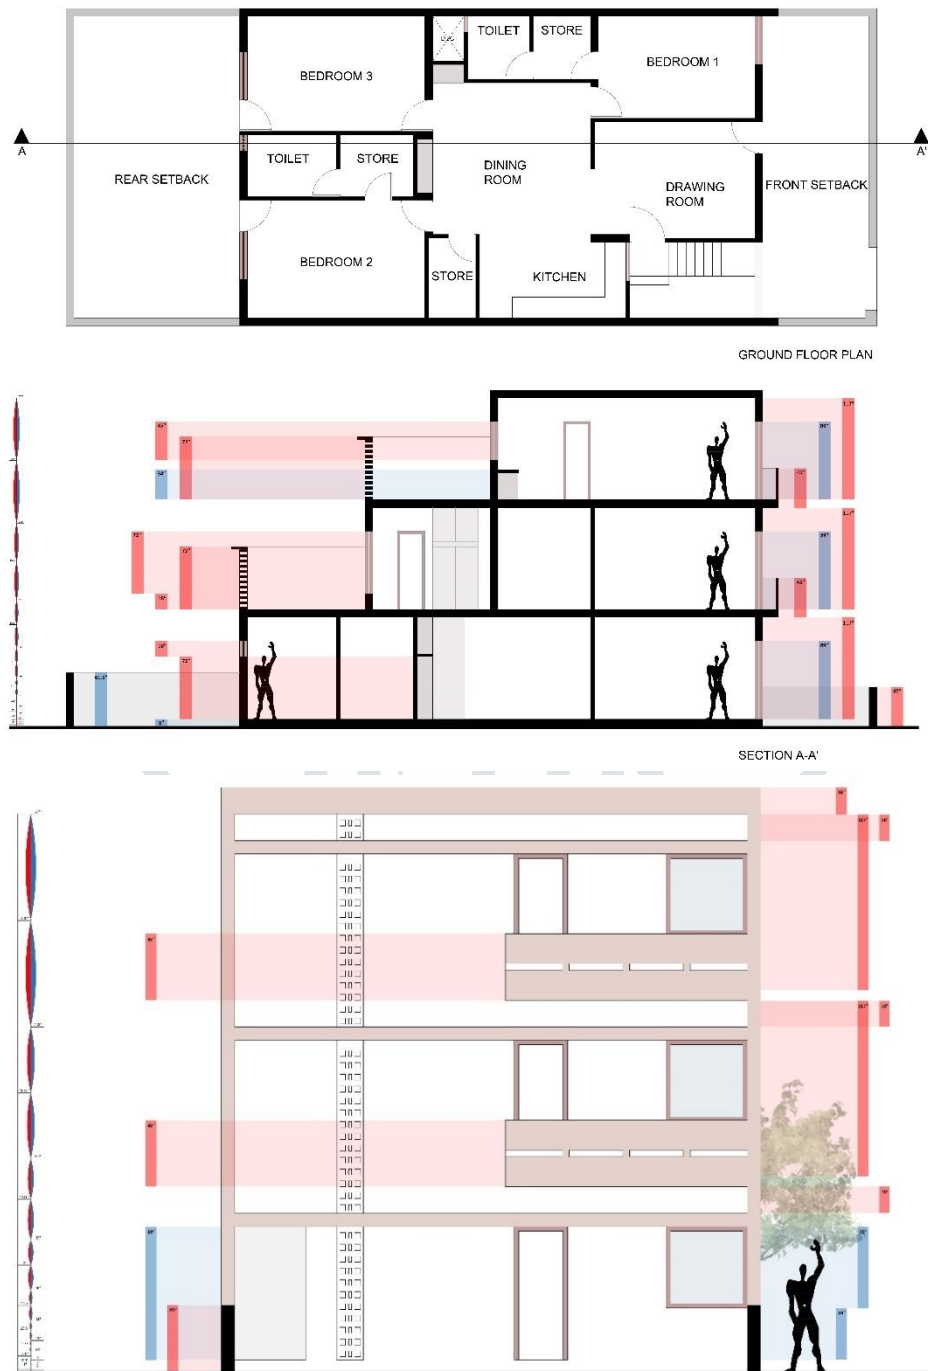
Plan, Section and Elevation of Government House of Phase 2
